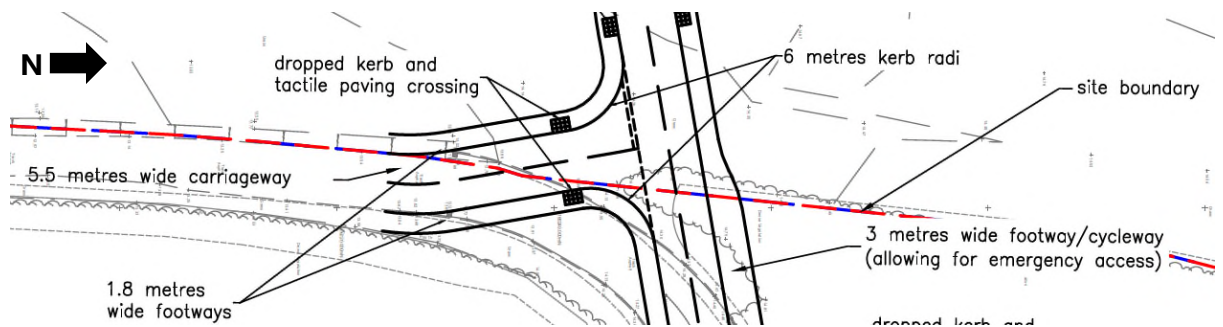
Owl's Hatch Road Internal Junction (Permitted Northwood Development Design)
